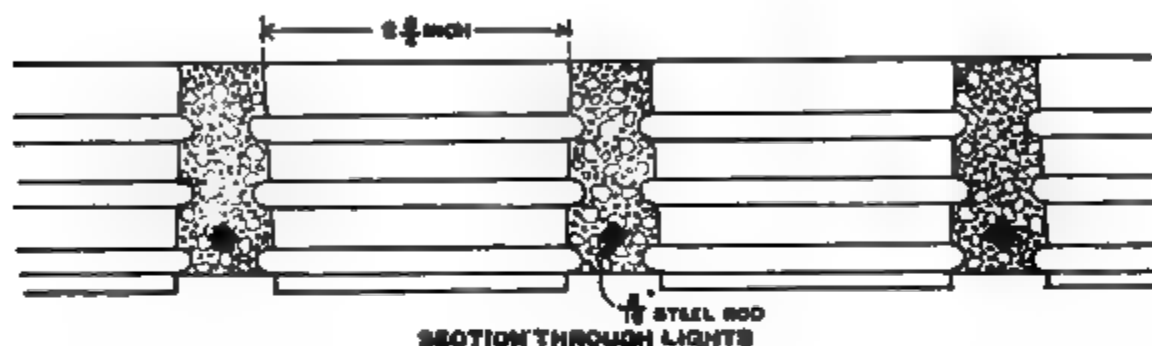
Typical Vault Light Construction. (See p. 444.)
